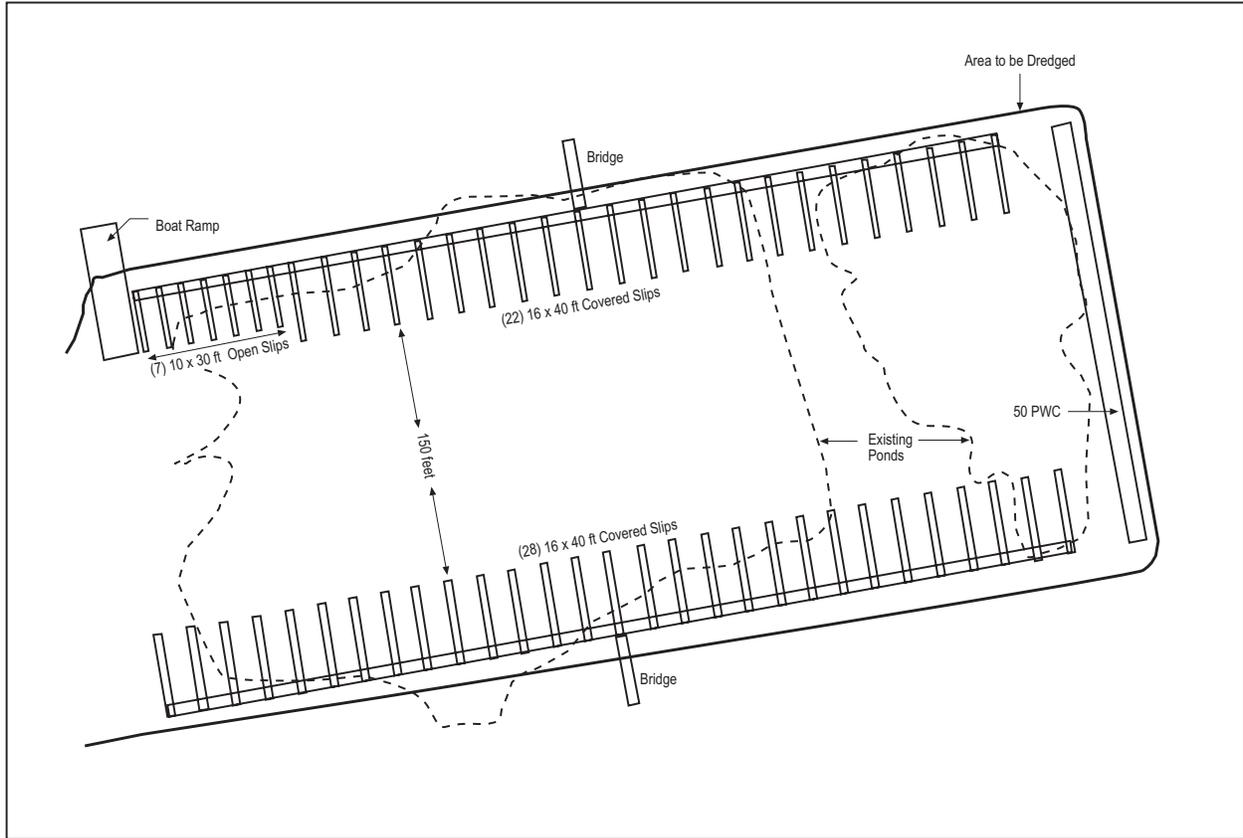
Proposed docks for Davis Cove (figure provided by applicant and not drawn to scale).
